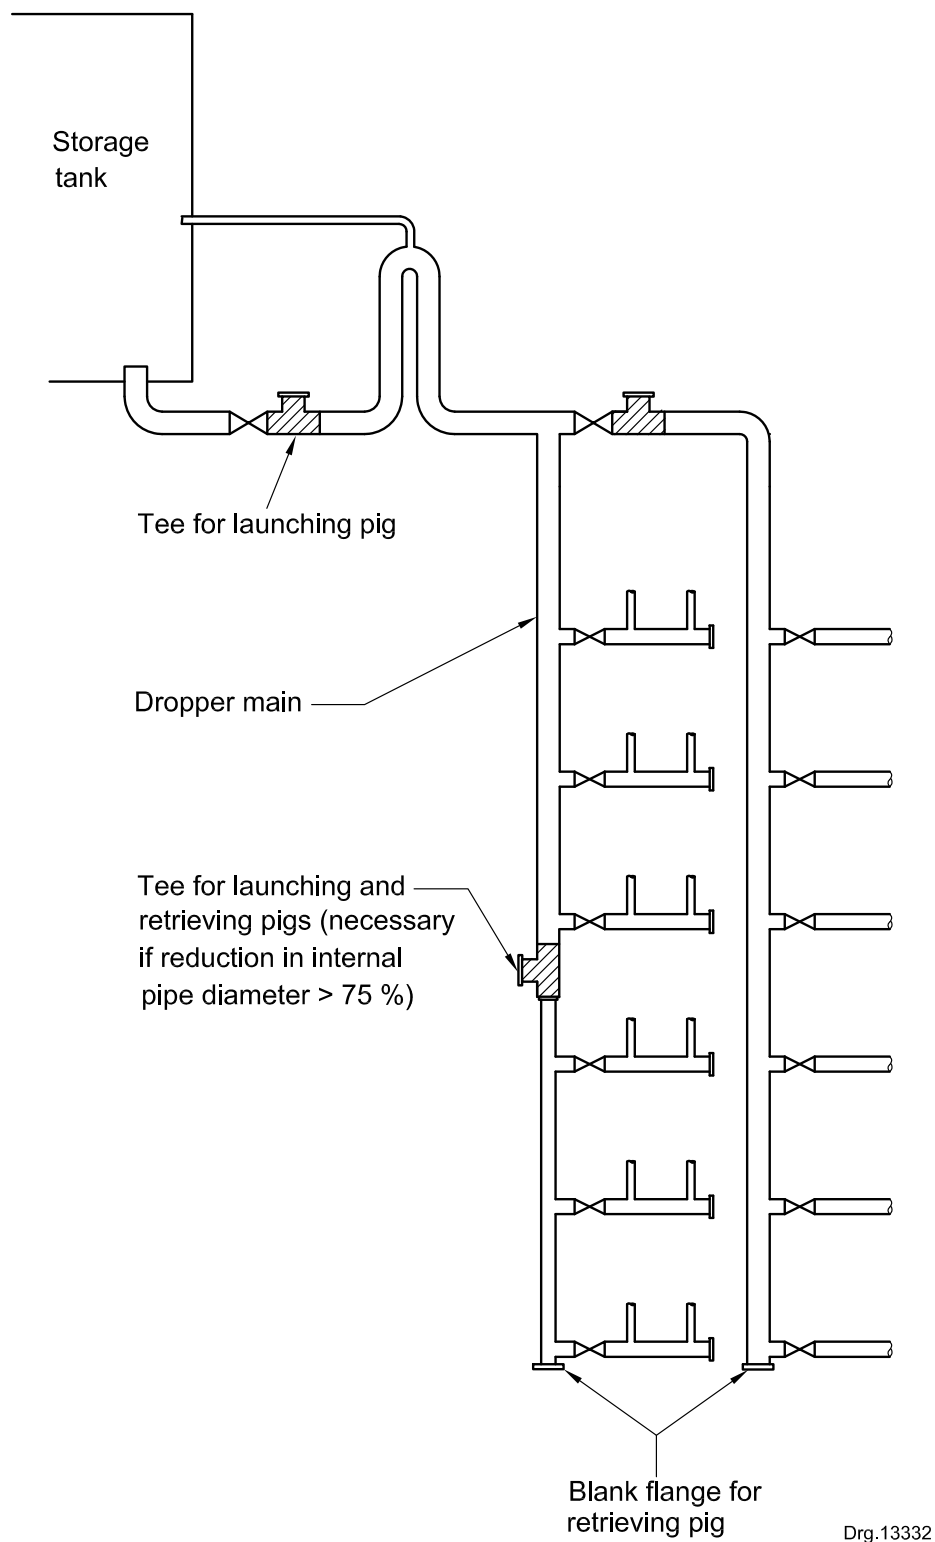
Typical arrangement for launching and retrieving cleaning pigs in a general installation
